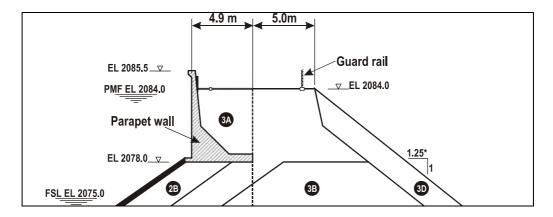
Parapet wall of Mohale Dam (Sundaram and Kleiner, 2005)
